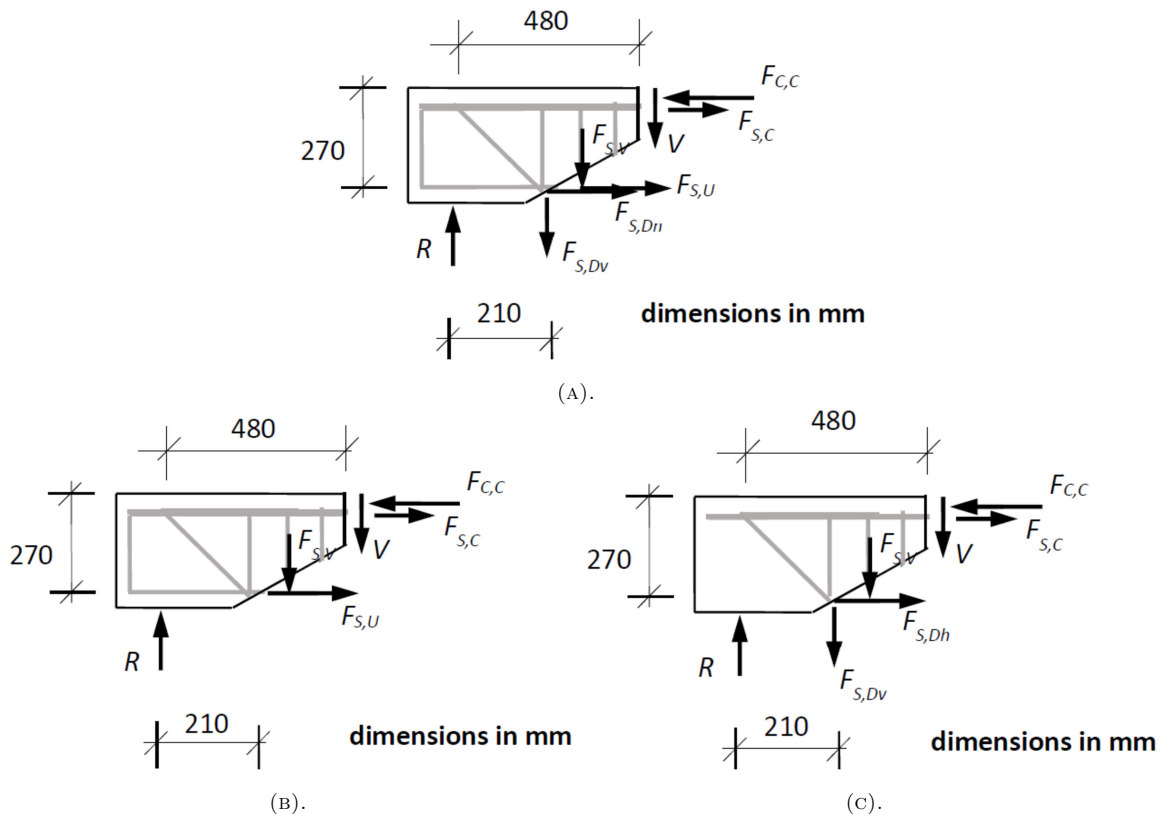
Internal forces in cross section including diagonal crack at re-entrant corner of beam (A) NS-REF, (B) NS-ND, and (C) NS-NU.
